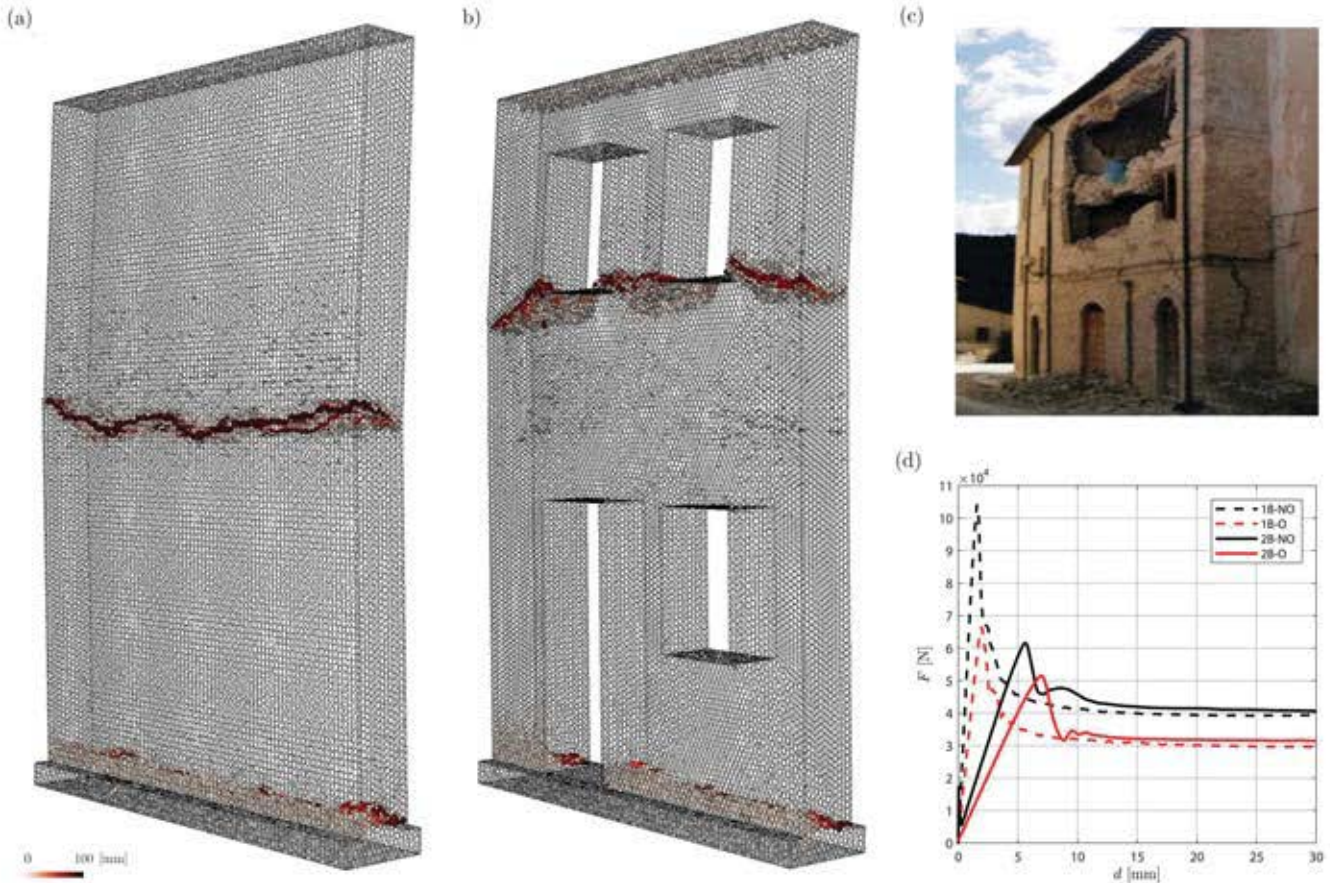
Total crack opening: (a) two-story wall with no openings (2B-NO); (b) two-story wall with openings (2B-O); (c) Example of two-story bending mechanisms caused by the 2009 L'Aquila earthquake (Arch. Fot. Vice Comm. Del. Beni Culturali - Sisma Abruzzo 2009); (d) force versus displacement curves for Cases 1B-NO, 1B-O, 2B-NO and 2B-O.
